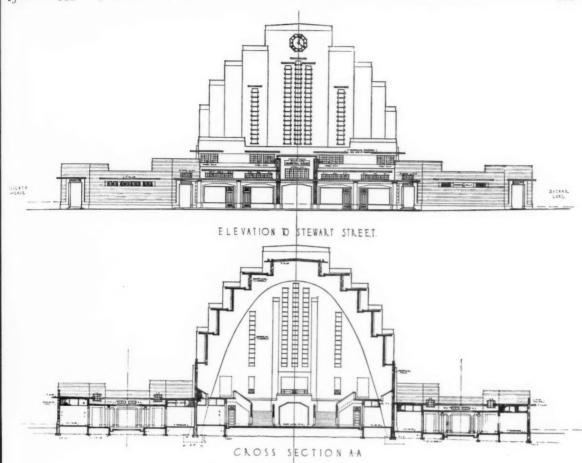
THE MARKET HALL, NAIROBI Elevation to Stewart Street, and cross section
